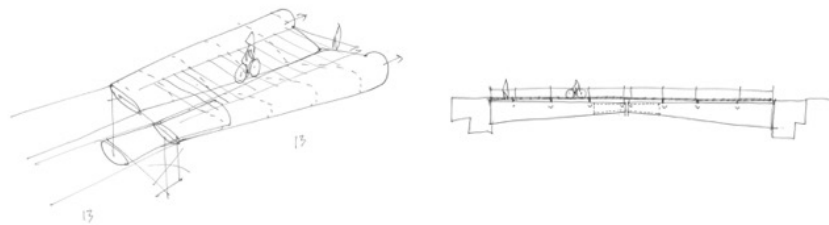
Sketch of bridge concept four. Architect: Pege Hillinge, Sweco.
